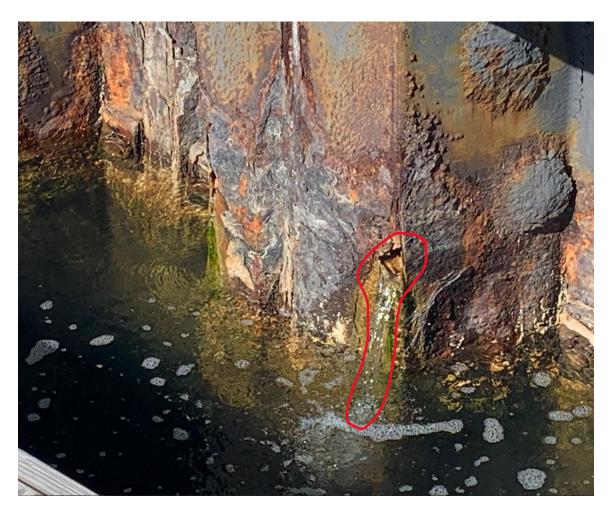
Hole in west wall with water coming through (Port Royal Side)
